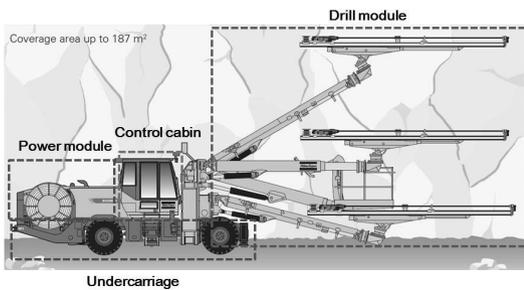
Parts and modules of Jumbo drill machine (Atlas Copco, 2013).
